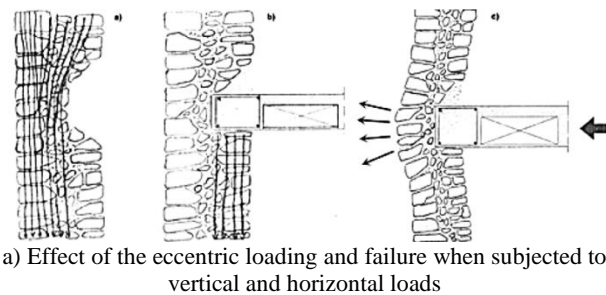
Eccentricity and redistribution of load in existing masonry walls due to RC beam positioning [75].
